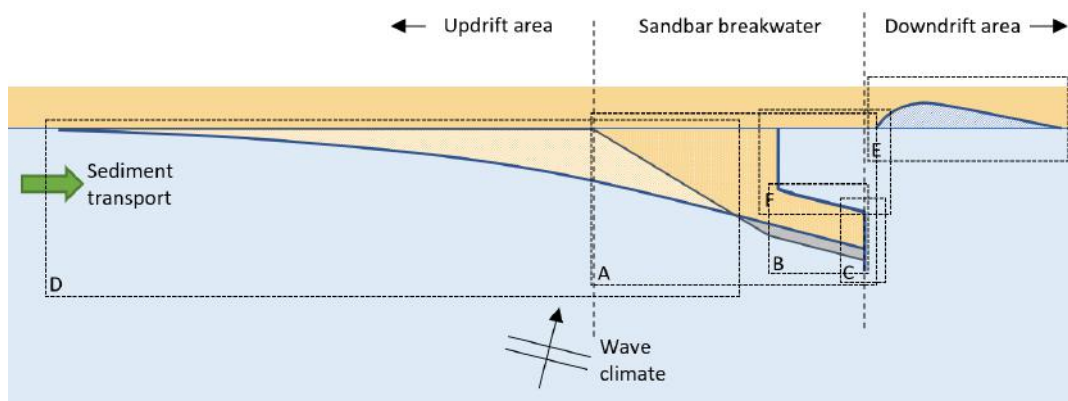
A sketch of the sandbar breakwater showing its initial layout (darker brown) and the resulting layout after adaptation to the wave climate (in lighter shade brown). The area surrounding the sandbar breakwater has been divided in several sections (updrift, breakwater and downdrift) and focus areas: A. Initial breakwater, B. Sandbar, C. Groyne, D. Updrift area, E. Downdrift area and F. Harbour basin. In grey erosion of the initial layout is shown.
